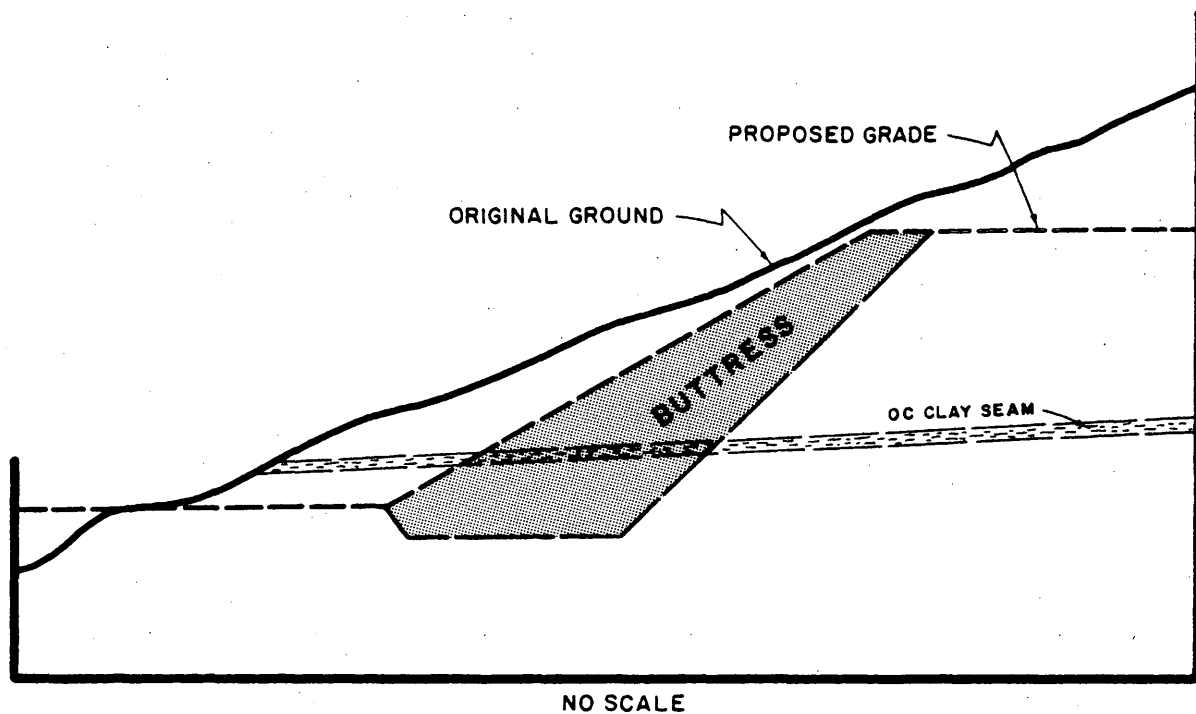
Typical cross section with buttress constructed to stabilize excavated slope.
